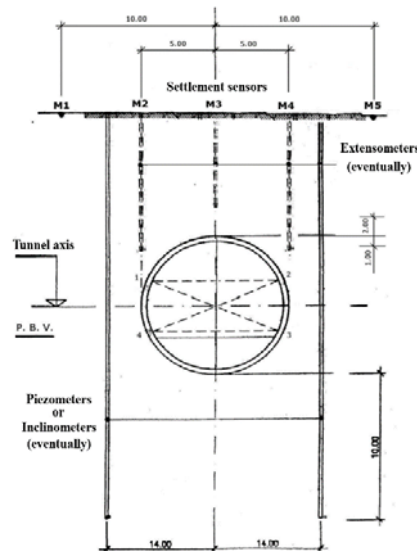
Instrumentation model for cross-section of Section 63 (adapted from Amaral, 2006).
